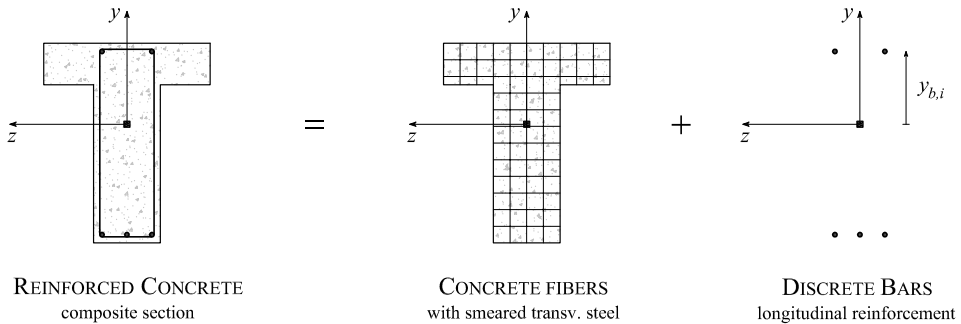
RC section: fibers with smeared steel and longitudinal bars.
